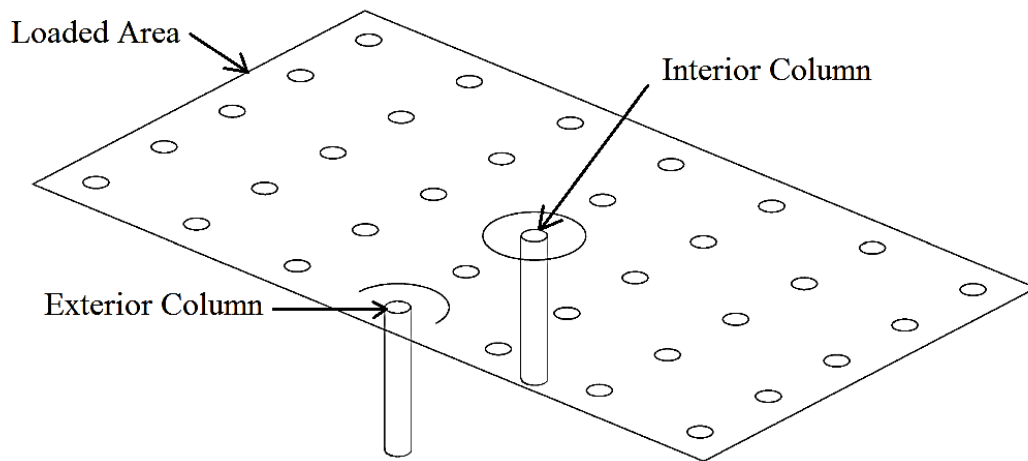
Site reinforced with stone columns showing interior and exterior columns
